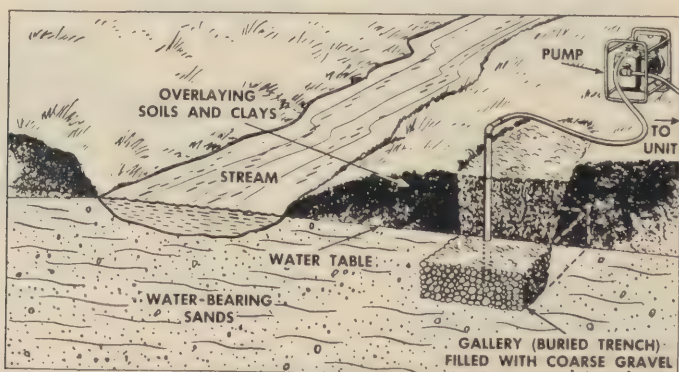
Gravel-filled gallery intake installed on bank of muddy stream.
